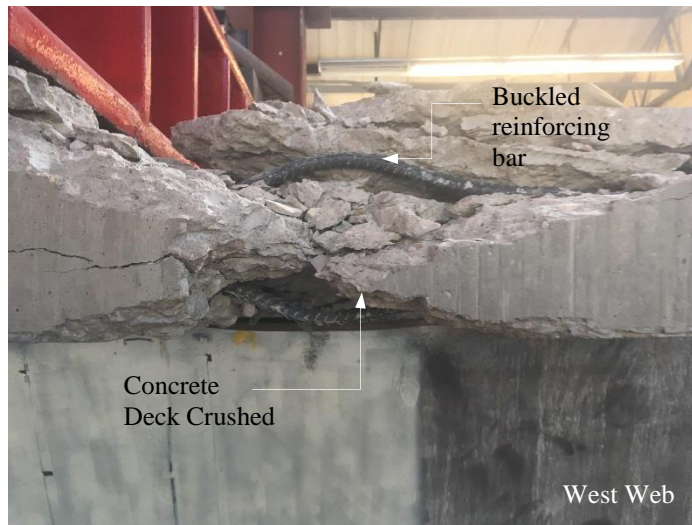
Concrete Deck Reinforcement Buckled – Tub #3
